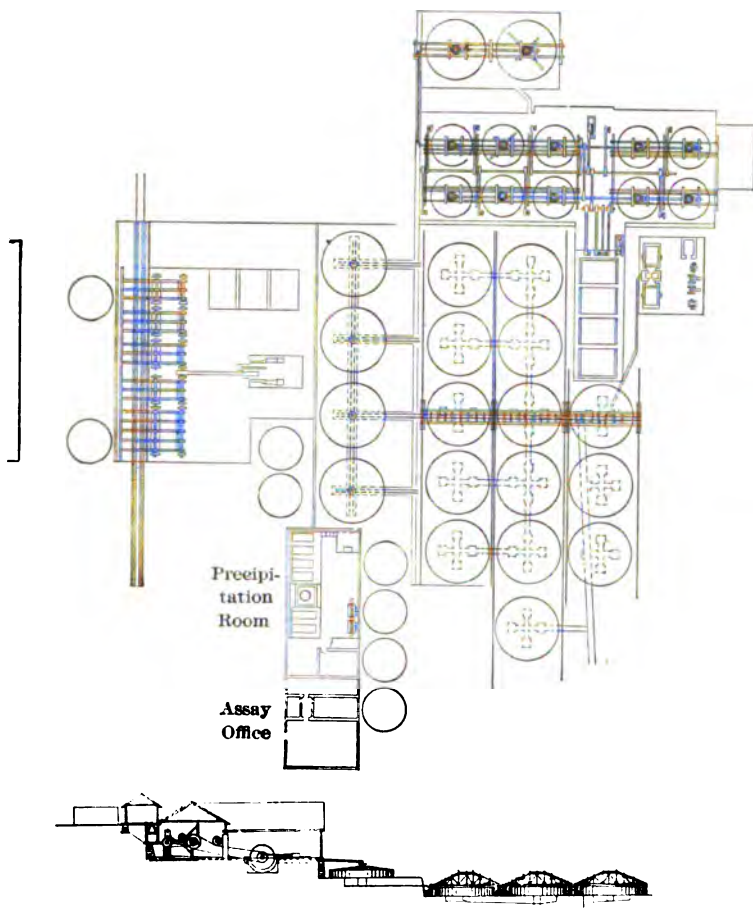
PLAN AND SECTIONAL ELEVATION OF MILL AND CYANIDE-PLANT.
